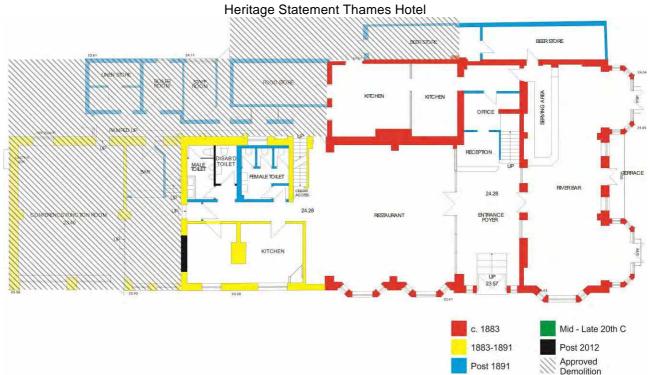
Phased ground floor plan showing approved demolition (not to scale)
